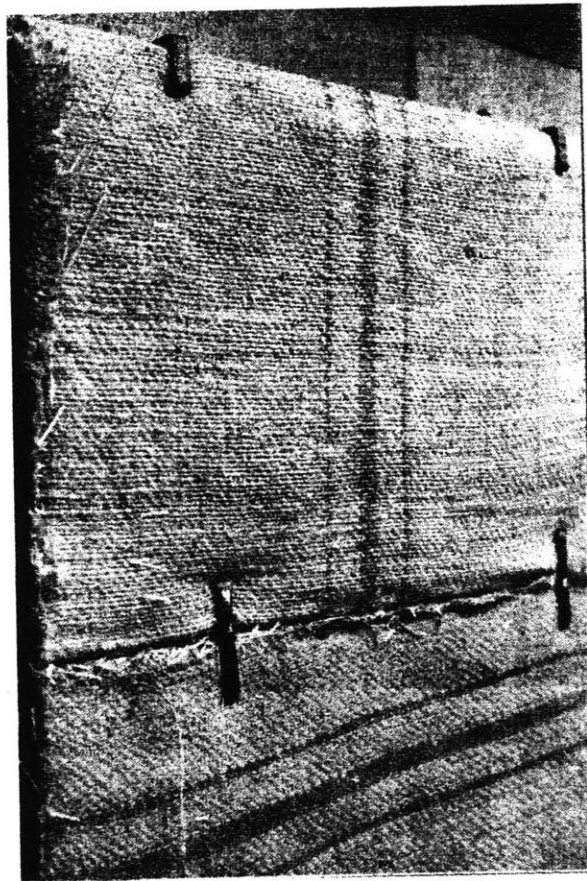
Jute faced straw boards fastened to masonry wall with metal brackets and masonry screws
